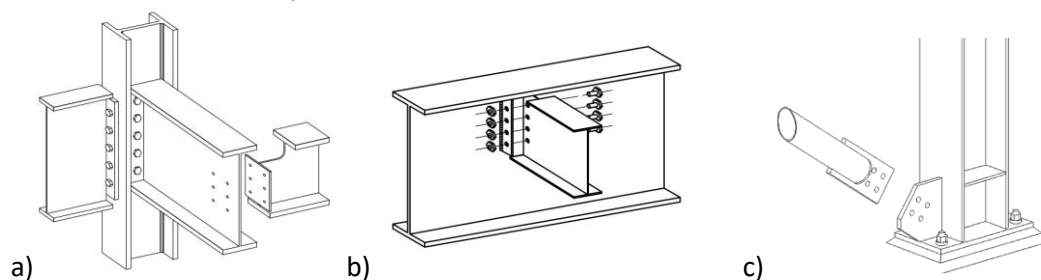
End plates joints (a) [43], fin plates joints (b) [43] and bracing joints (c) (adapted from [44]).
